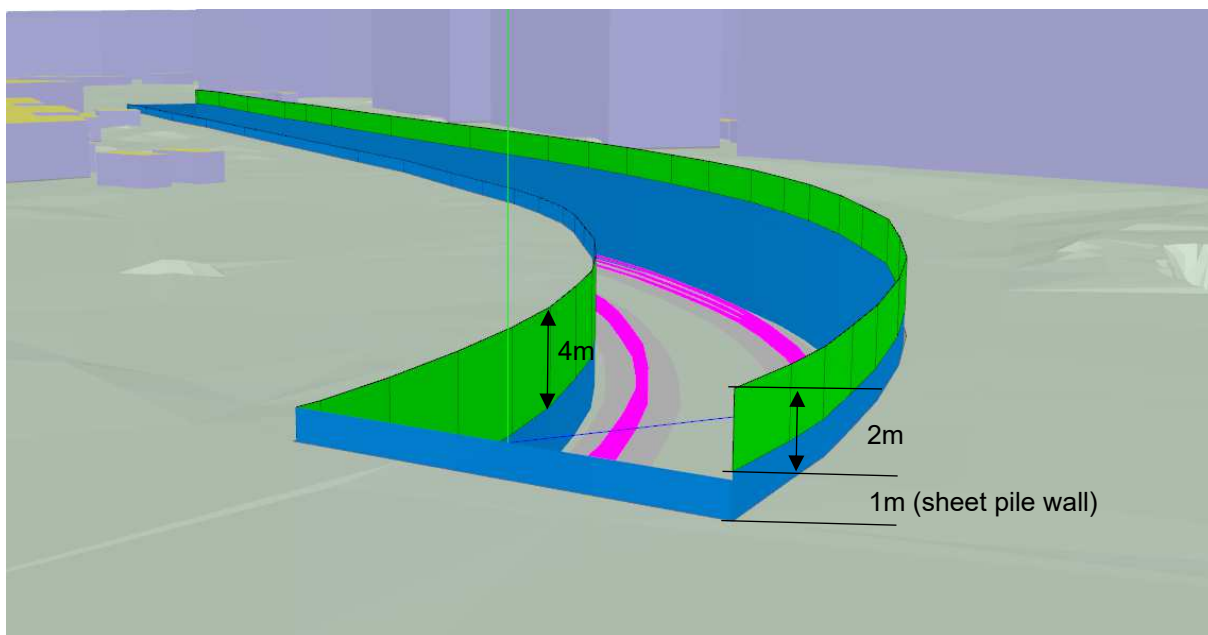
Scenario 5. 2 m high vertical sound-absorbing barrier on the northern sheet-pile wall, with the upper 4 m of the southern sheet-pile wall fitted with sound-absorbing material.
